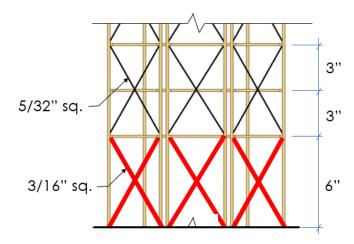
Bottom Floor Elevation: Bracing Size Comparison
